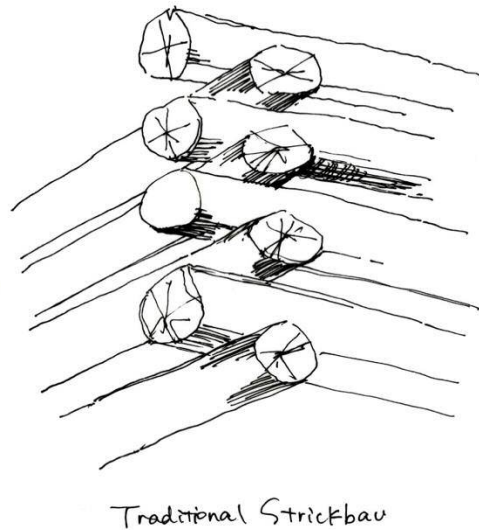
Sketch showing the traditional construction method – Strickbau. Round logs weave with each other to form the building corner.
